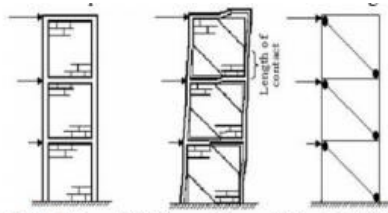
a) Infilled Frame b) Deformed Frame c) Equivalent Strut Model
